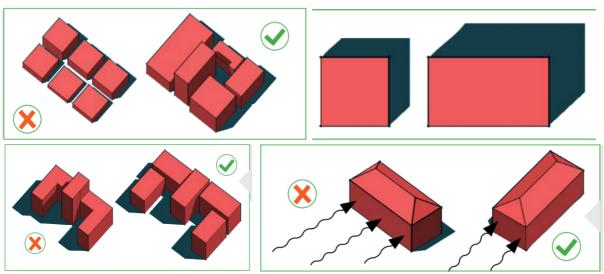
Disaster resilient building design pattern (credit: TESRA ppt)
